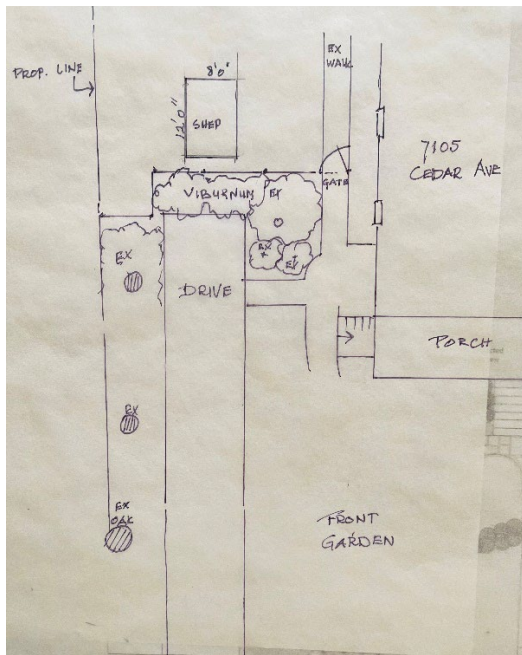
The applicant provided this site plan of the front and side yards to show the fence location and proposed shed location.
